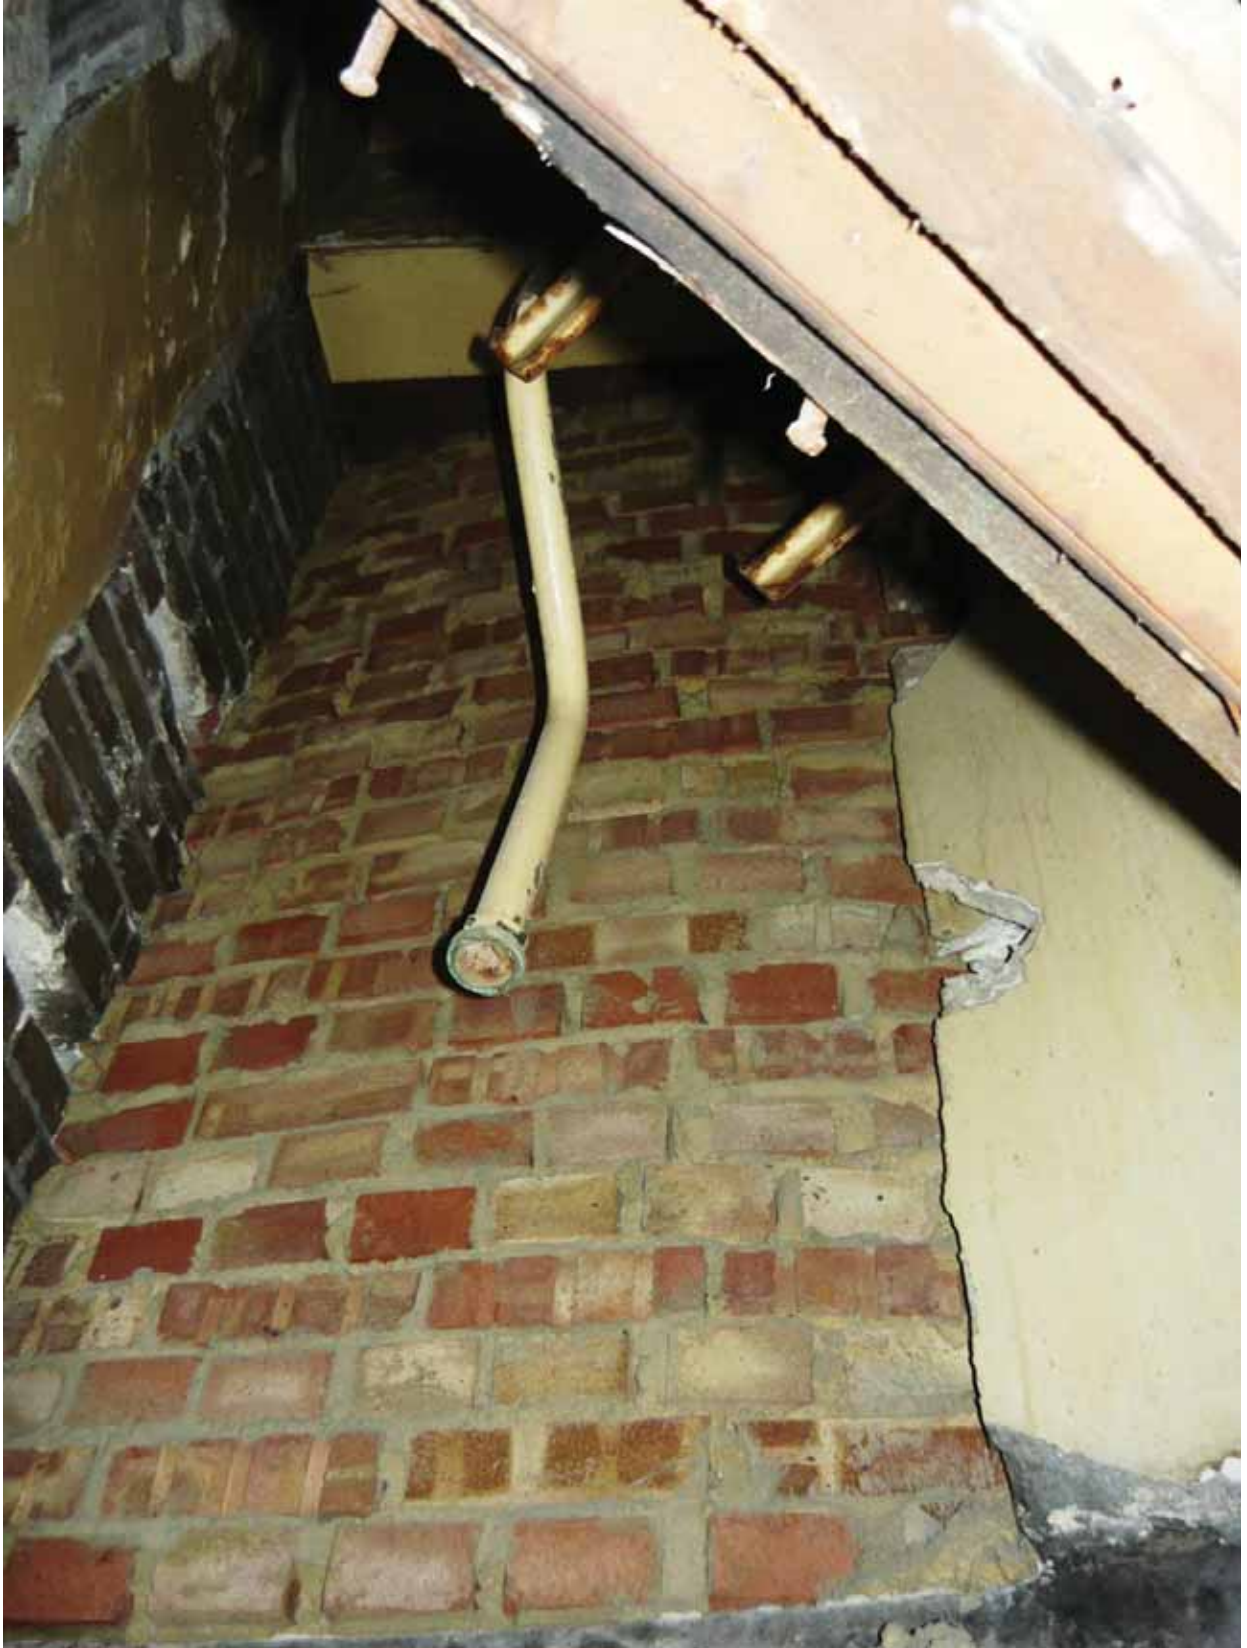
Inside cupboard at the south end of the east wall in Room G03, looking up and south-east (EAF10 BHD7 (24))
